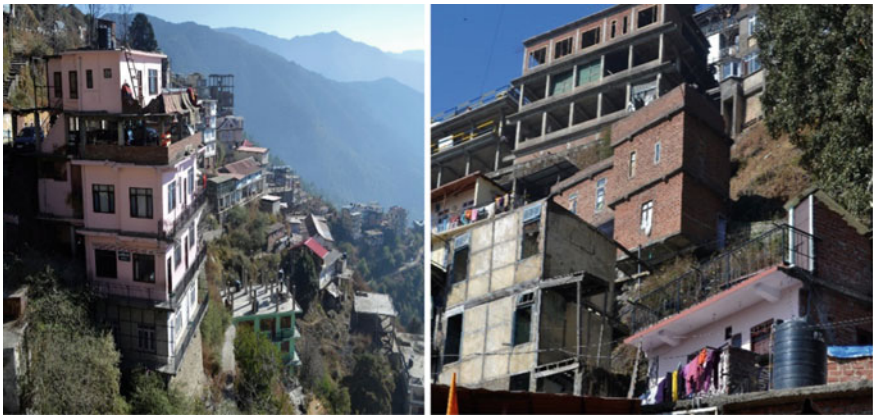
RC building structures on slope with vertical and horizontal irregularities in Shimla, Himachal Pradesh
